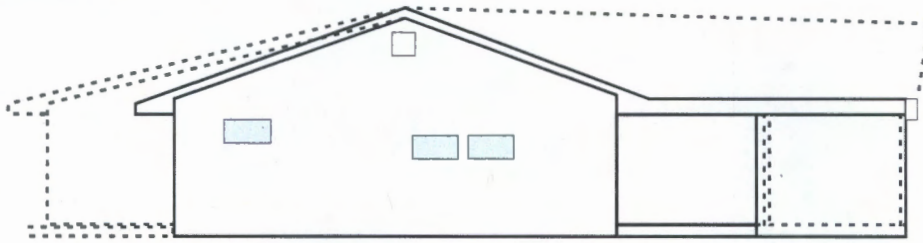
Elevation view existing house viewed from outside from east looking west. Solid lines and dotted lines to the north of the roof peak, (to the right in the diagram, towards the street) are the existing house. The dotted roof line to the north is in the middle of the occupied (i.e. non-carport) part of the north part. Dotted lines to the south give an elevation view of the addition. The small rectangle is the location of possible heat
